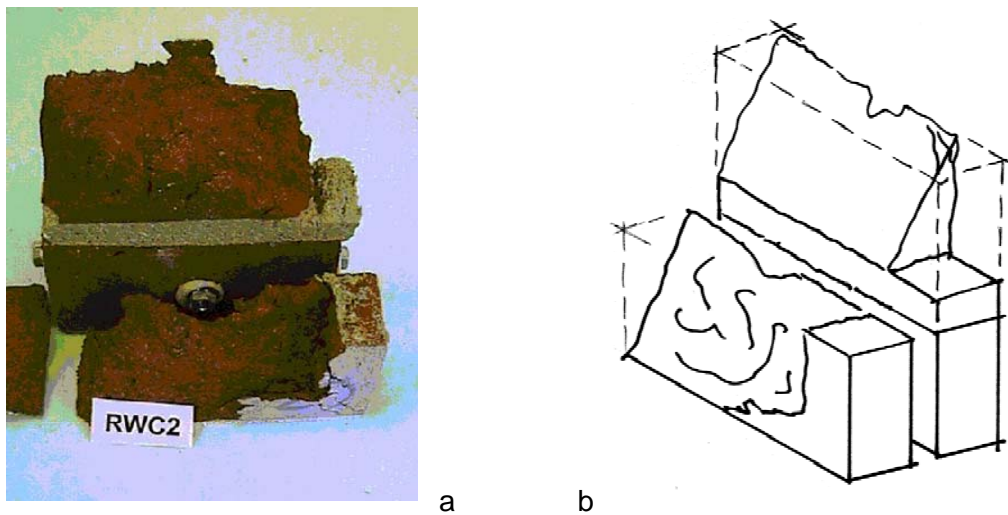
a) Top and bottom part of a fractured RY specimen (coded RWC2) showing diagonal cracking of the top brick and an approximately 20 mm deep fissure. b) Sketch of the top part put up-side down in front of the bottom part of the specimen.
